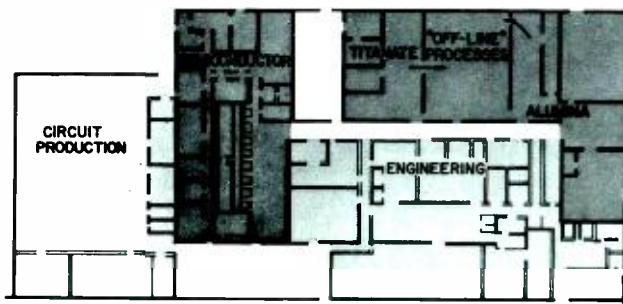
Floor plan of Rockville Road Plant—85,000 square feet.
